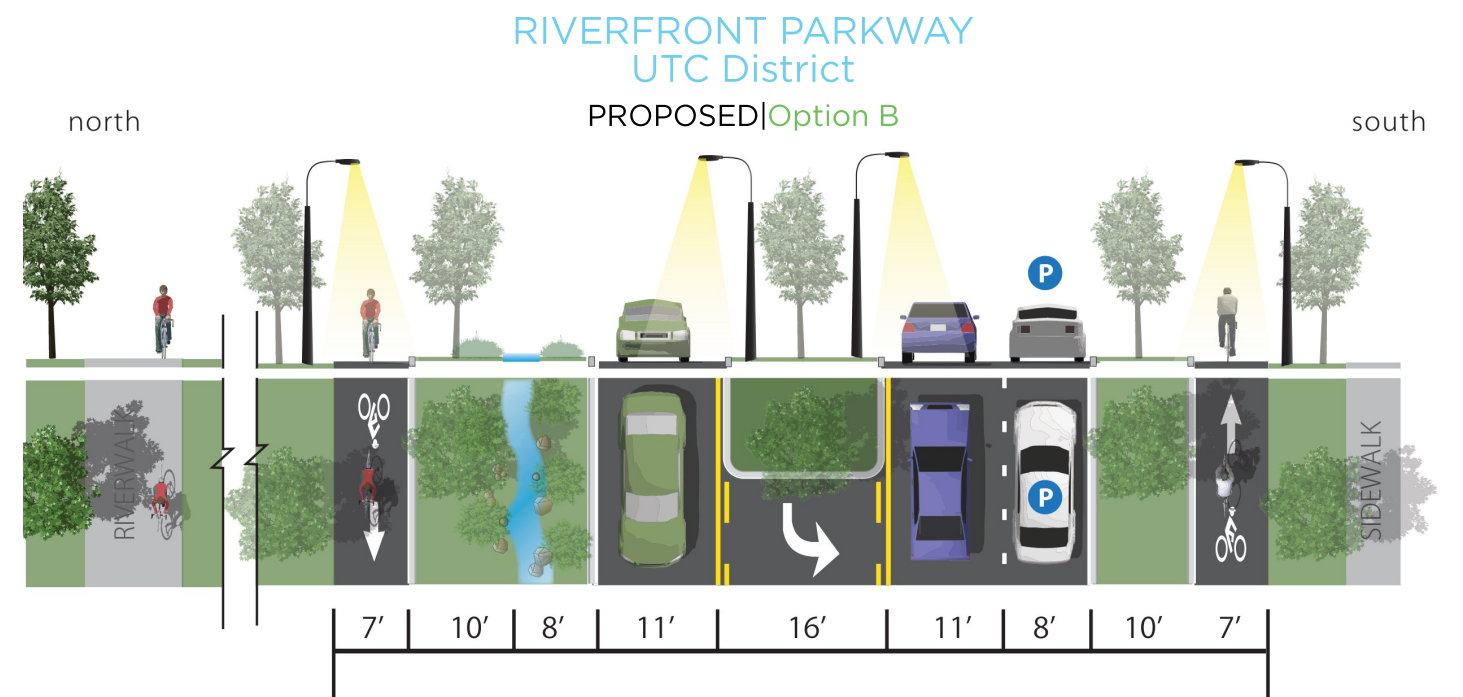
Riverfront Parkway Cross-Section | UTC, Proposed—Option B
